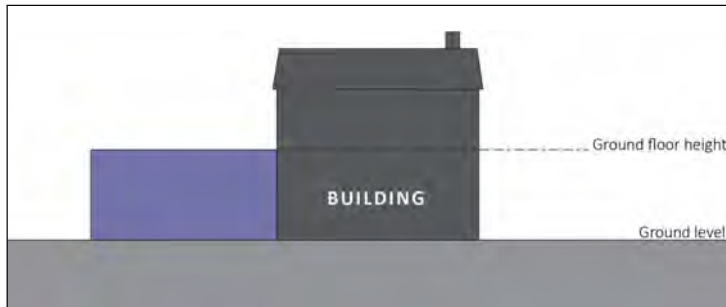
Construction of a single-storey addition or extension to an existing building is exempt if the walls of the addition do not exceed the ground floor height of the existing two-storey building; (note this graphic does not indicate or specify the form of the roof to the addition)
